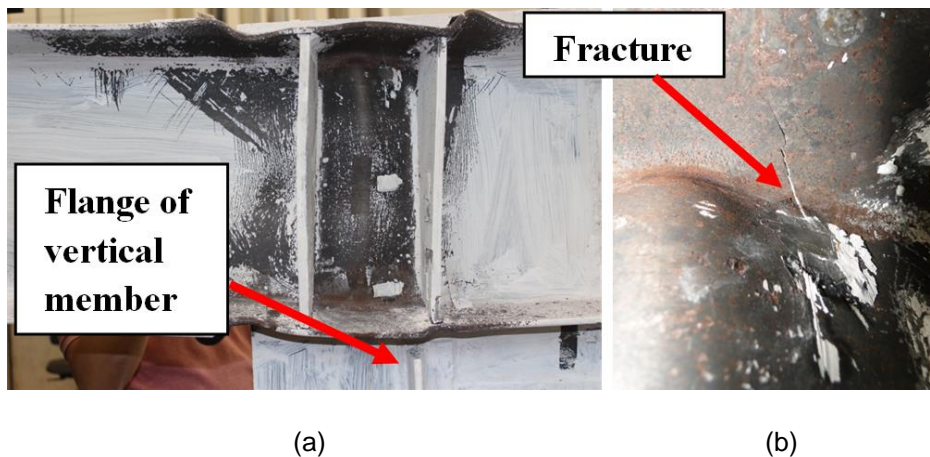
(a) Local buckling and fracture in 2C12-7 at the top intersection between web and flange
